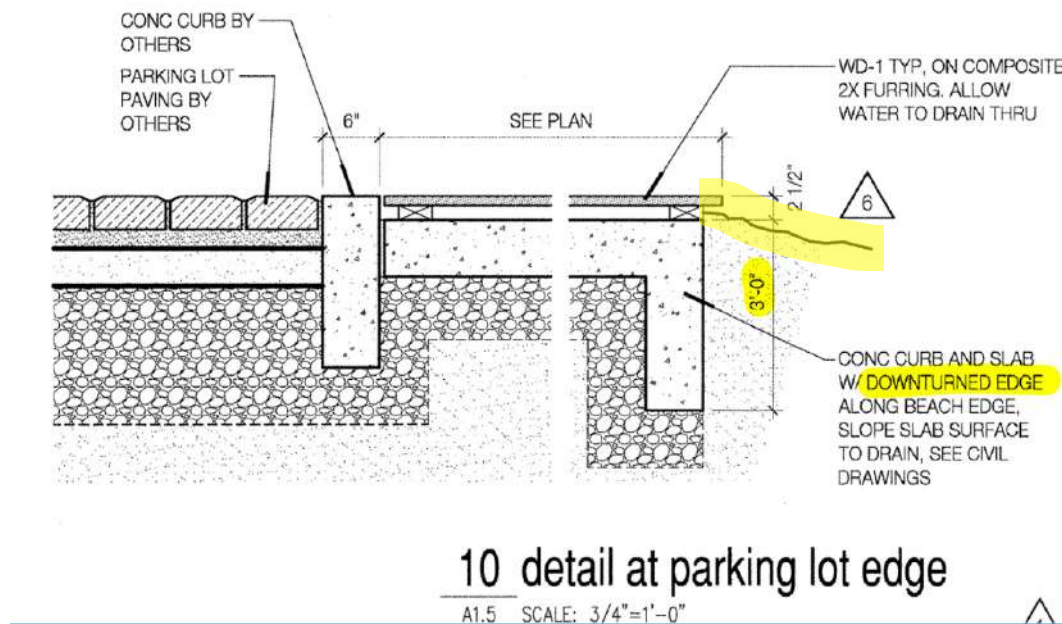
Parking Lot Edge, Detail 10 on Sheet A1.5 of DWA Plans
